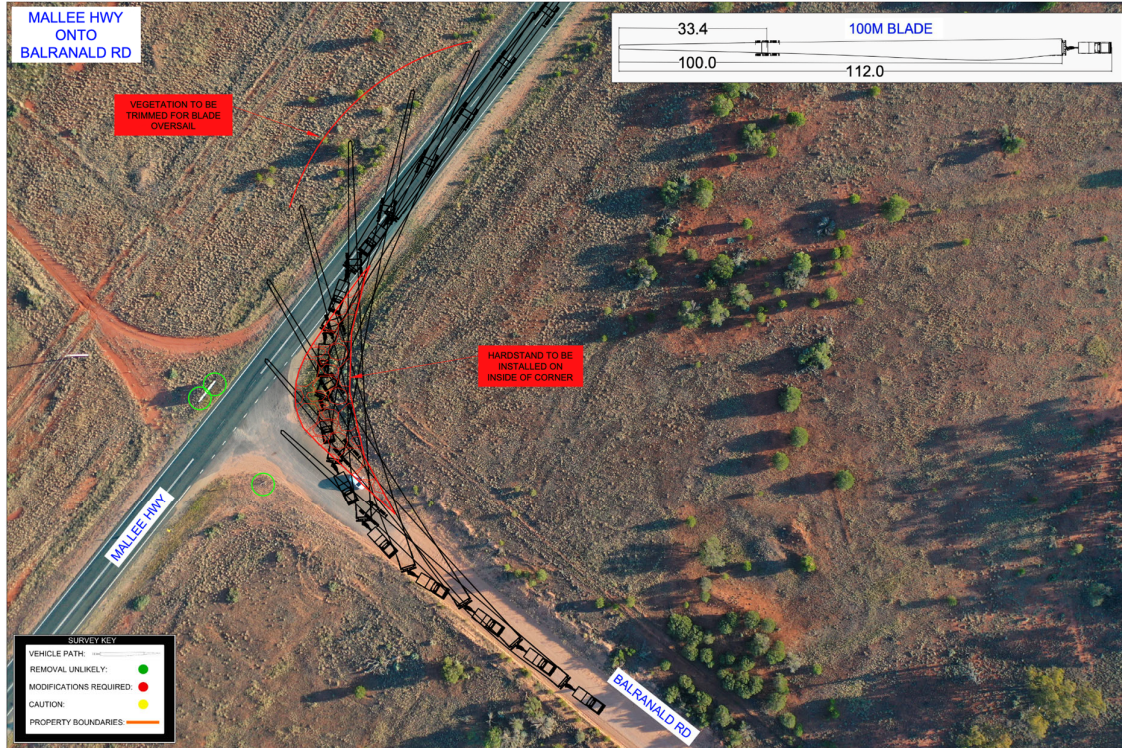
Mallee Highway onto Balranald Road at Yanga, NSW.
